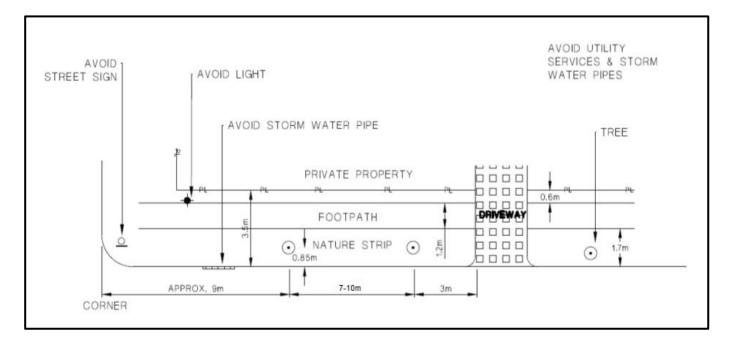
Planting Guidelines for Street Trees on Local Roads (With Footpath)
